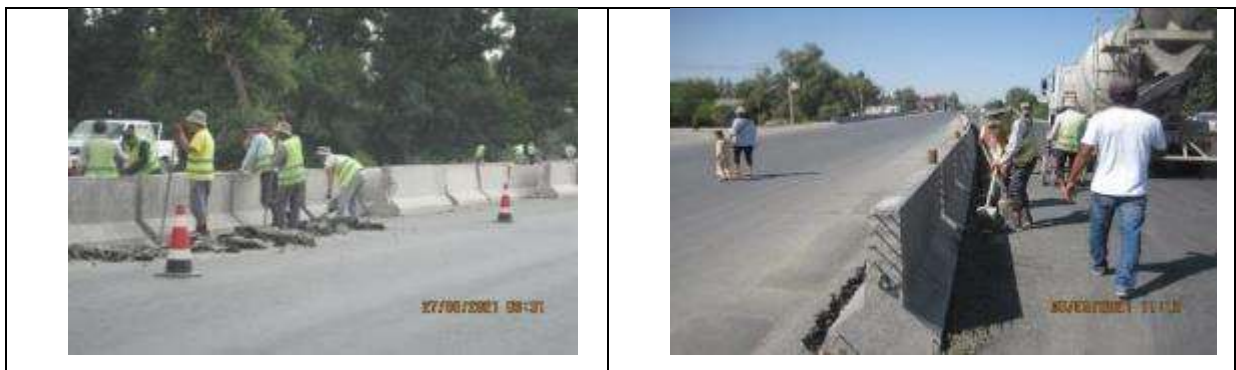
Works on concreting of ditches on the carriageway between the parapets.
